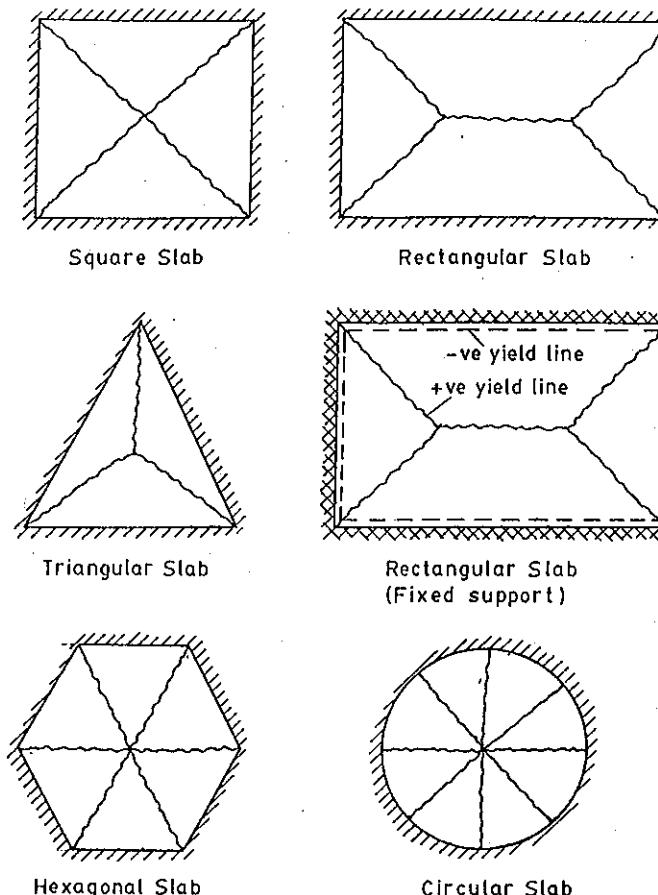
Typical Yield Line Patterns in Reinforced Concrete Slabs
